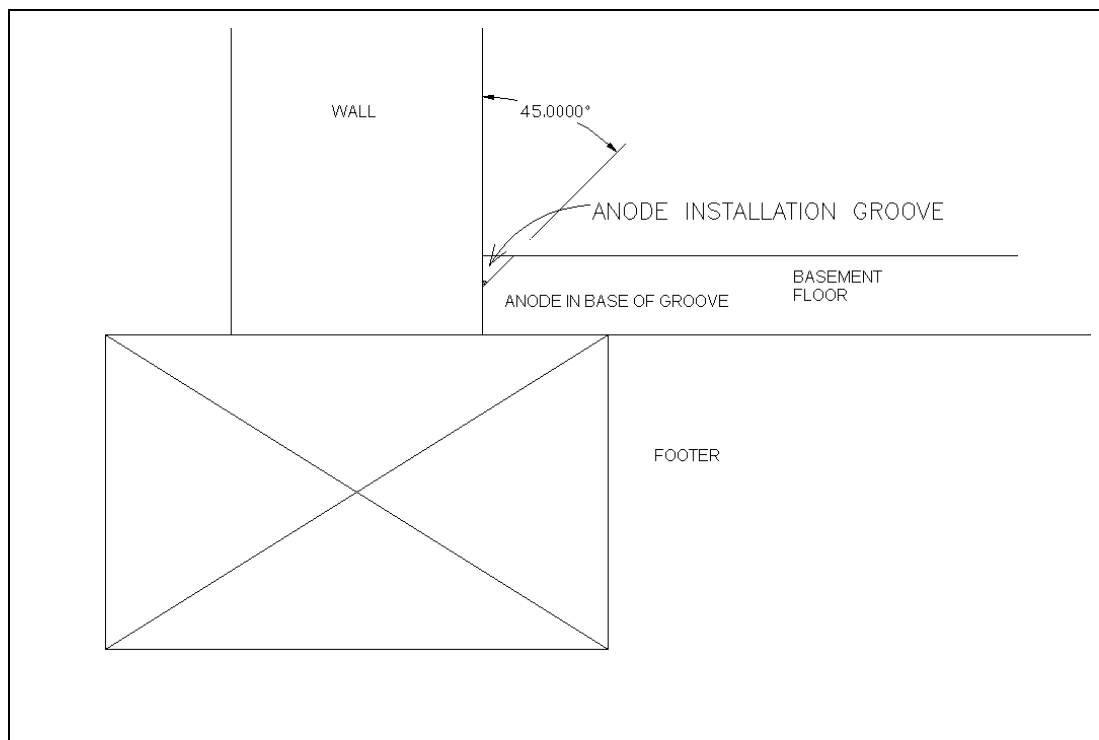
EOP ceramic covered wire anode installed at wall-to-floor joint.
